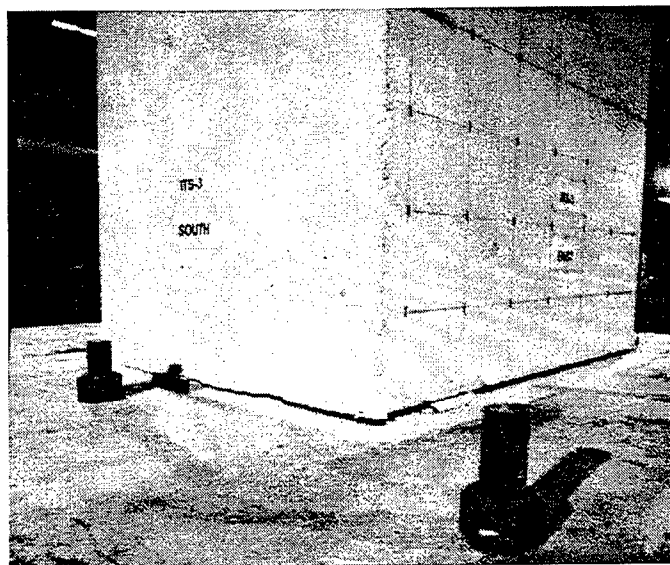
ITS-3 view of south and east walls, imposed top deflection of 1.6 in. towards the west.
